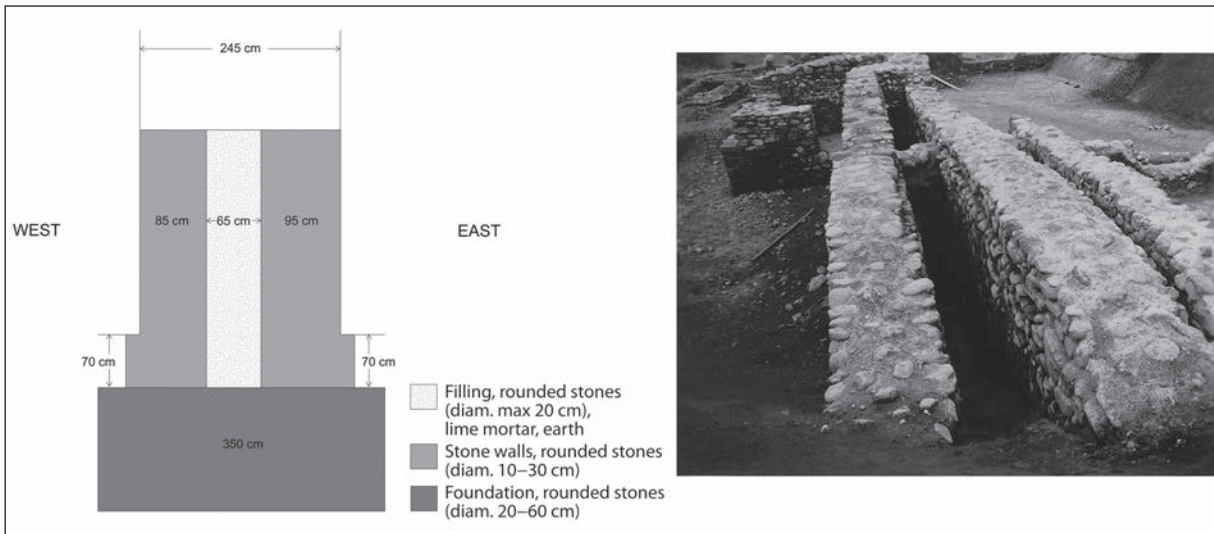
Schematic layout of the city wall (left) and view of the city wall from north to south (north of the gate at the *decumanus maximus*), where one of the connection walls is visible (right).
